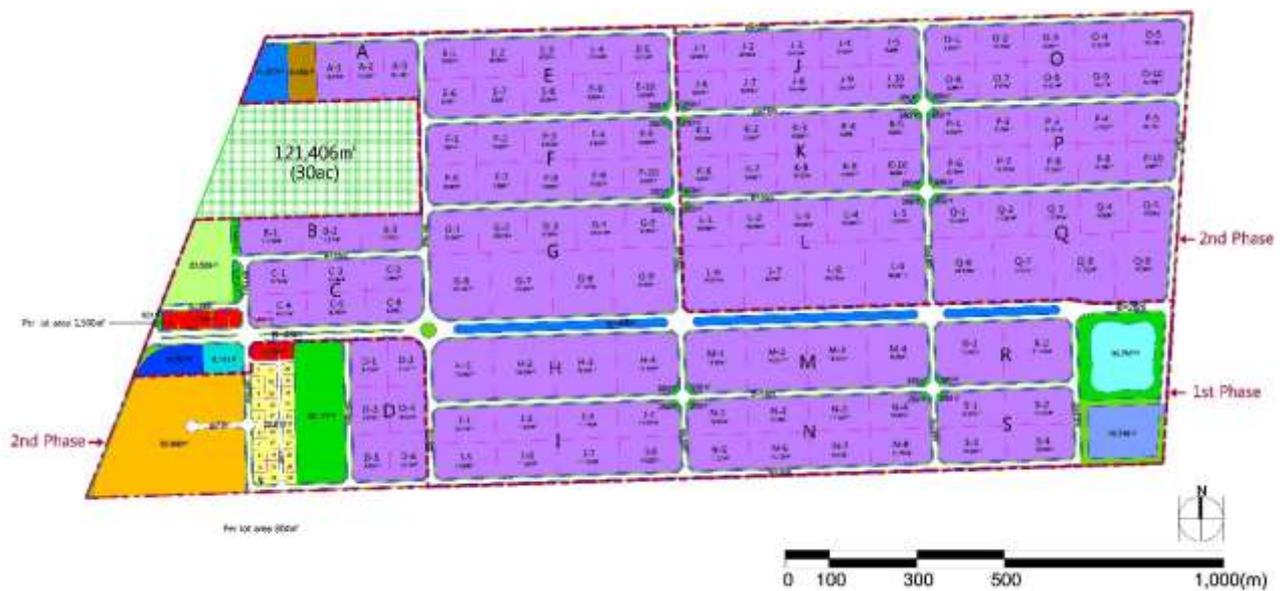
Lot Layout and Land Use Plan Drawing (See large image A3 size in Appendix 7)
